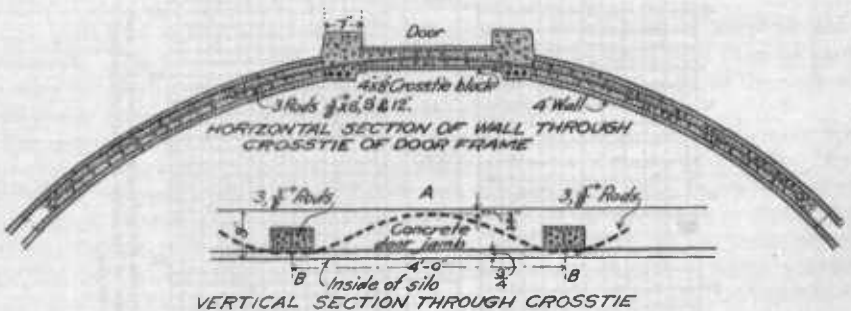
Section of wall and cross-tie for continuous door frame.
